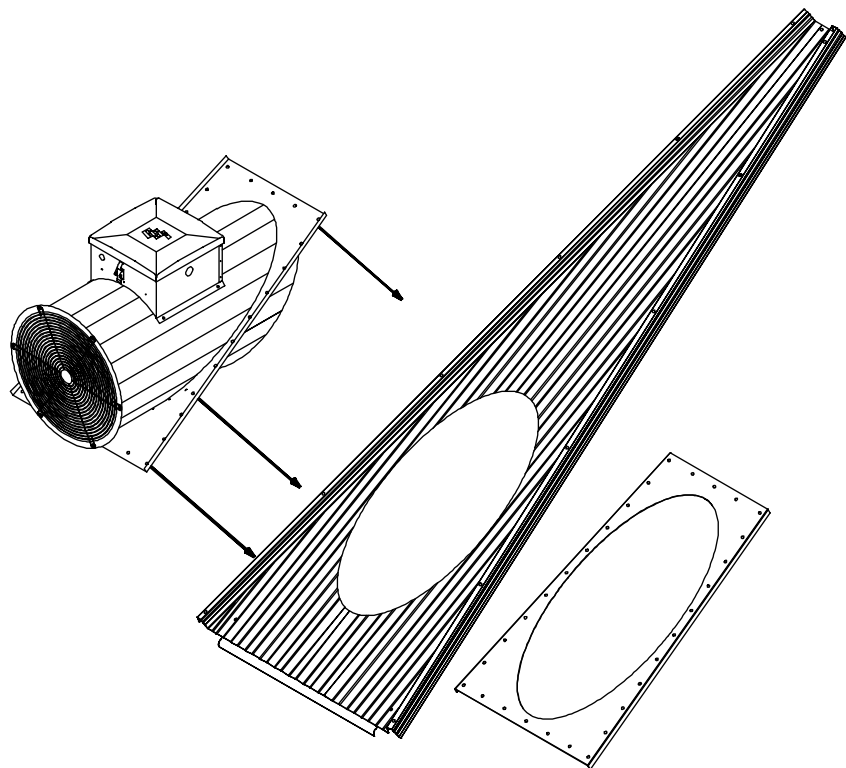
The 18" roof exhauster fan in relation to the roof sheet.
